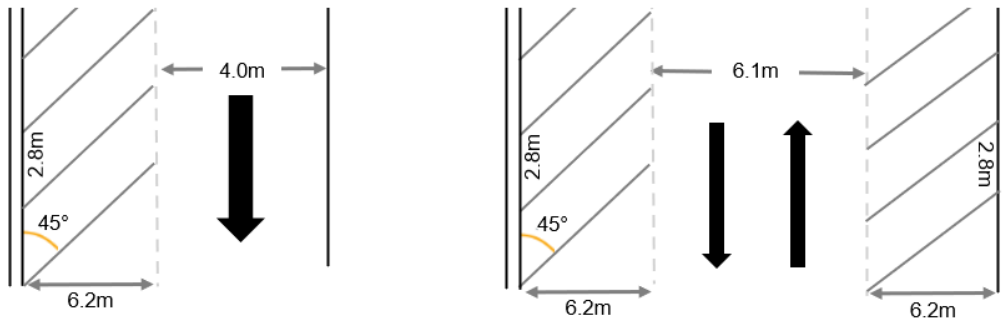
45-degree parking stalls and drive aisle dimension requirements
